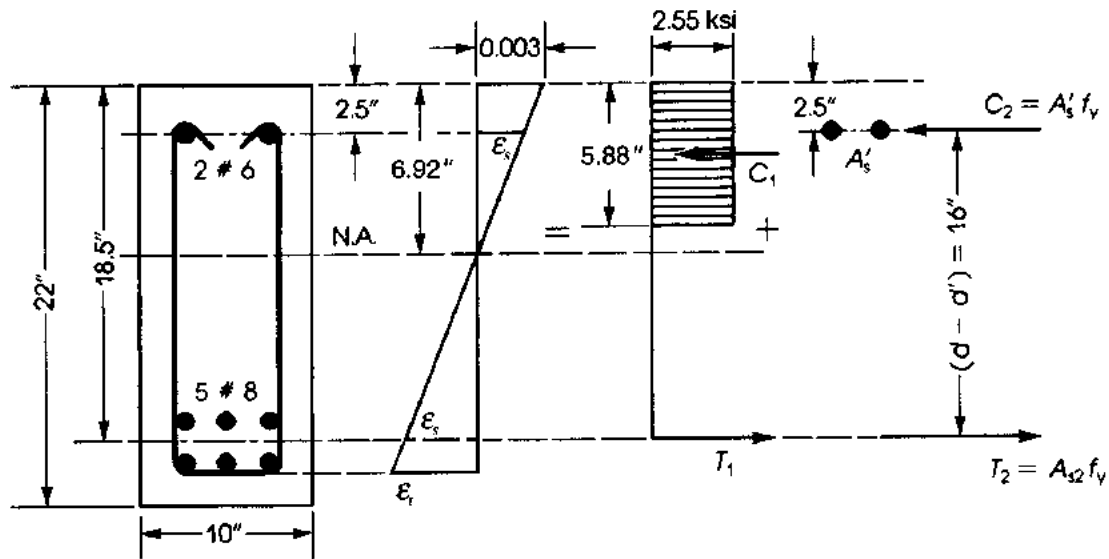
Example 4.5: doubly reinforced concrete section.
